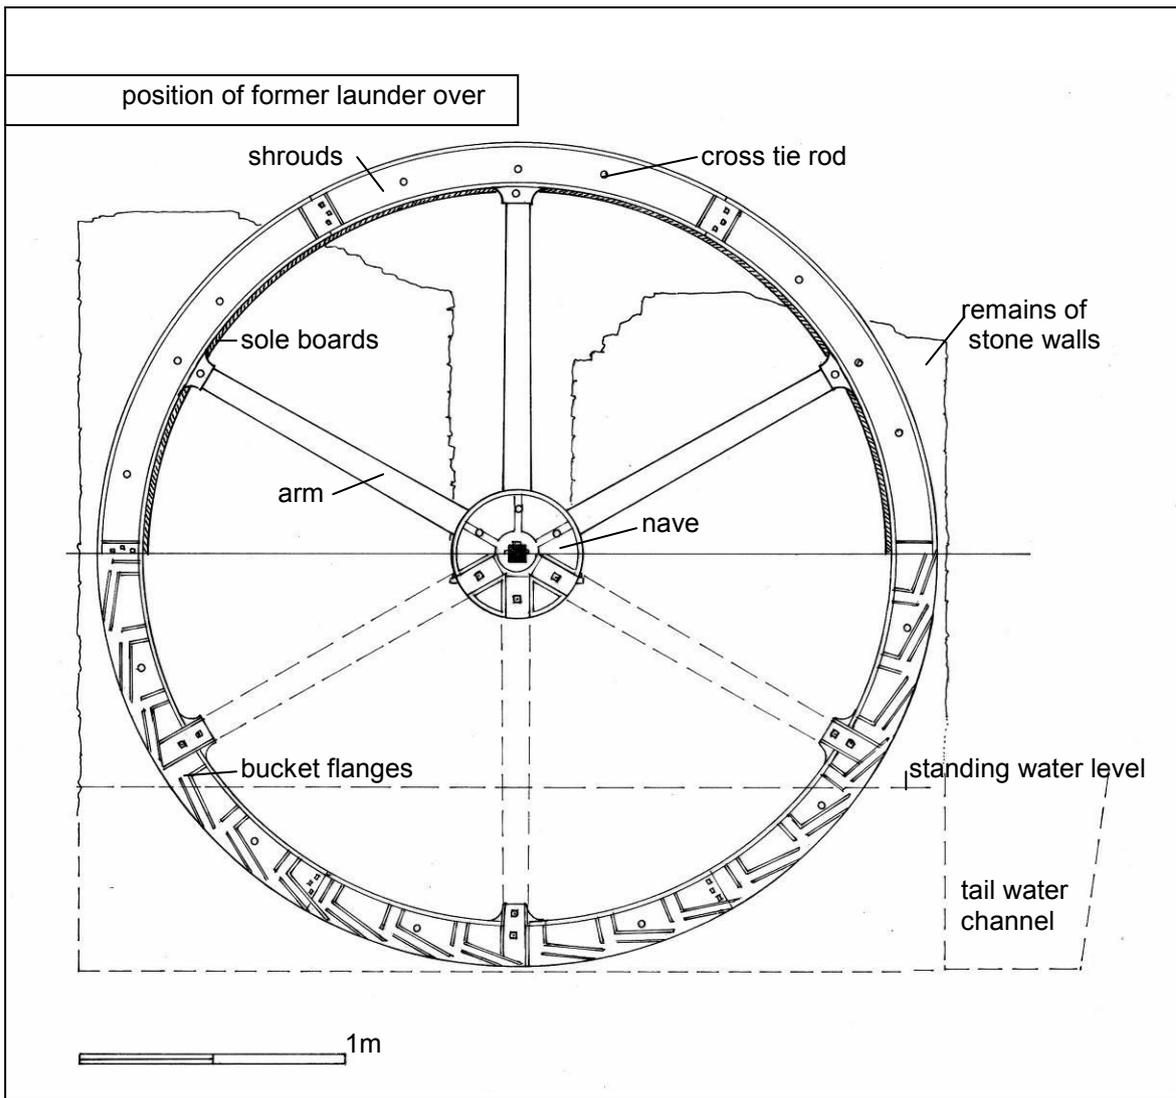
Lower Marsh Farm. Elevation and section of waterwheel, with arms reconstructed. Depth and shape of wheelpit and tail water channel are conjectural
